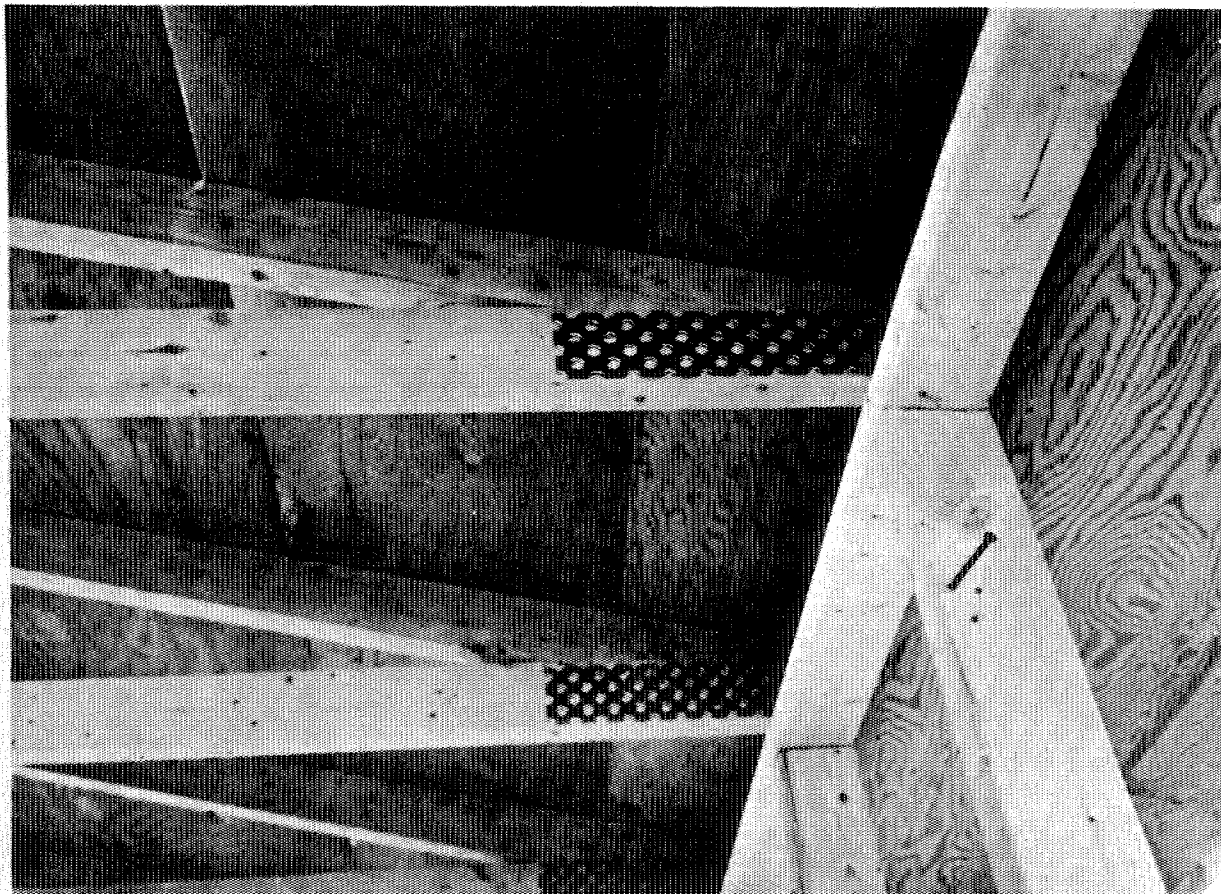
This photograph shows the truss connectors used on the Mark IV house in 1964.
